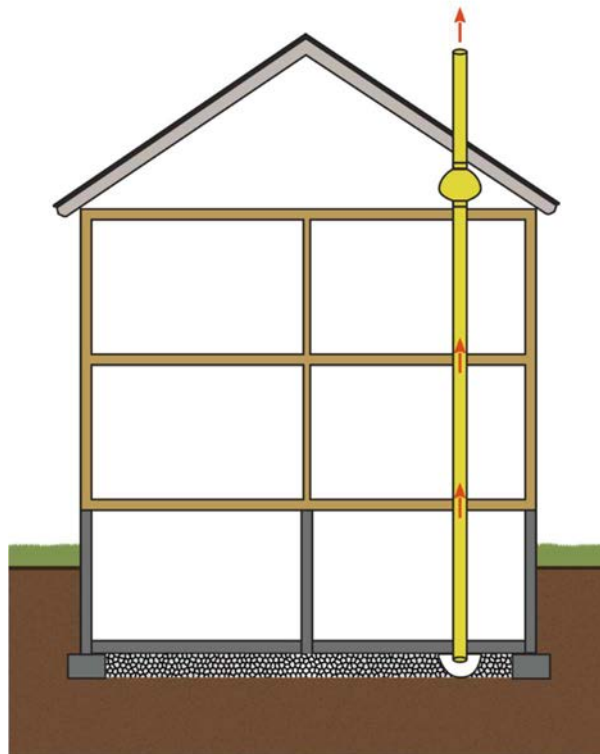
Sub-slab depressurization with internal fan in ceiling and roof level exhaust from building with basement.
